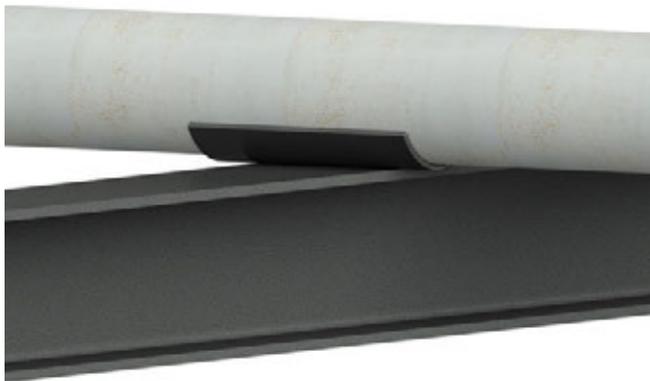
Traditional FRP pads cradle a pipe from beneath and require epoxy to be installed.
